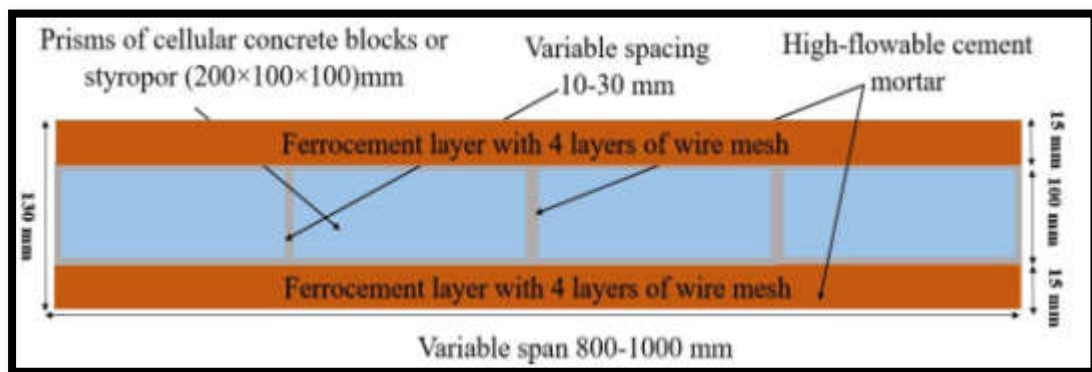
Cross section details for ferrocement sandwich G_3 specimens.
